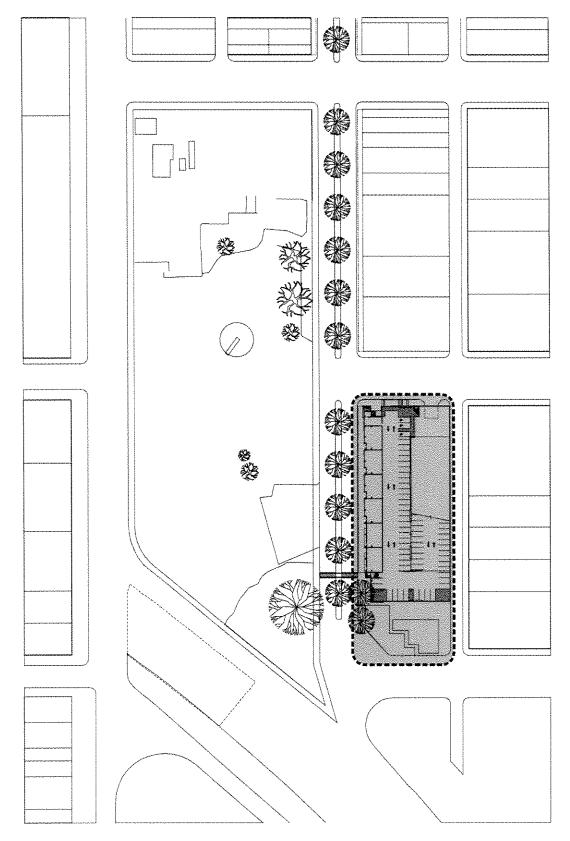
Conceptual Design for the Railroad Block Mixed-Use Parking Structure – Site Plan
